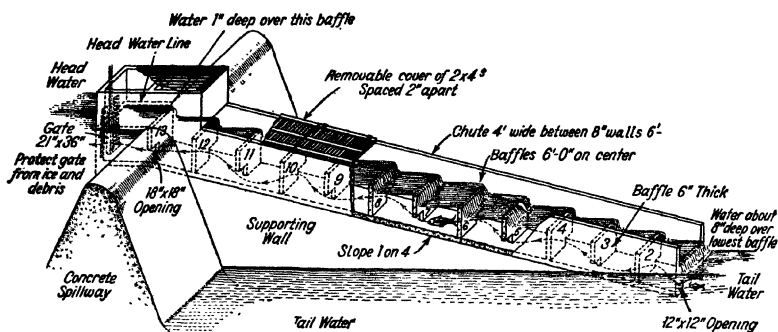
View of Reinforced Concrete Fish Chute. Reinforcing not Shown. State of Michigan, Department of Conservation. Make Openings through Baffles Increase in Area Uniformly between the Lowest and Highest Opening.
